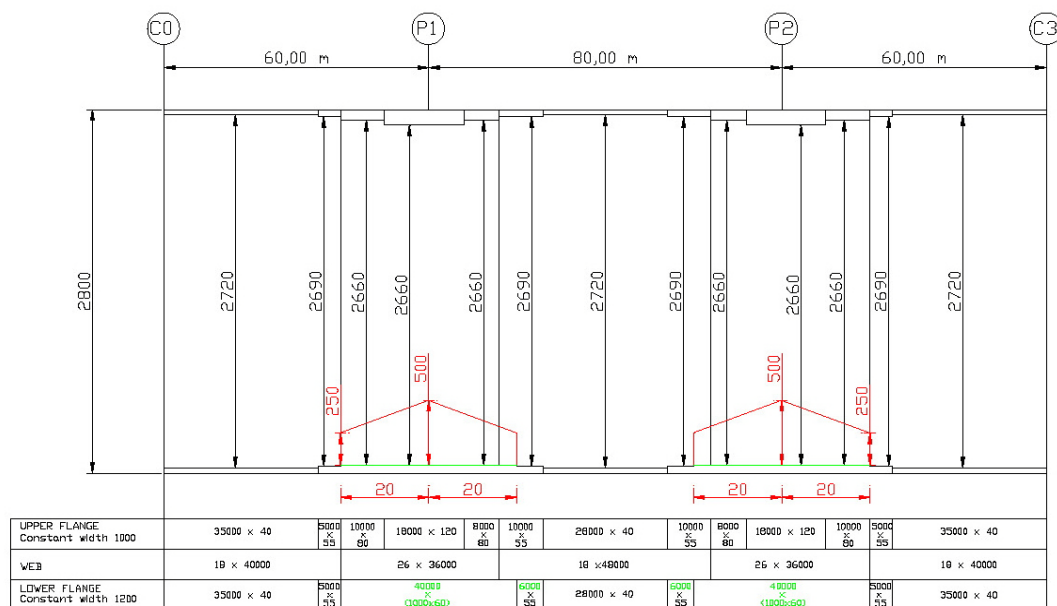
Alternative steel distribution of the double composite main girder and bottom concrete slab thickness
